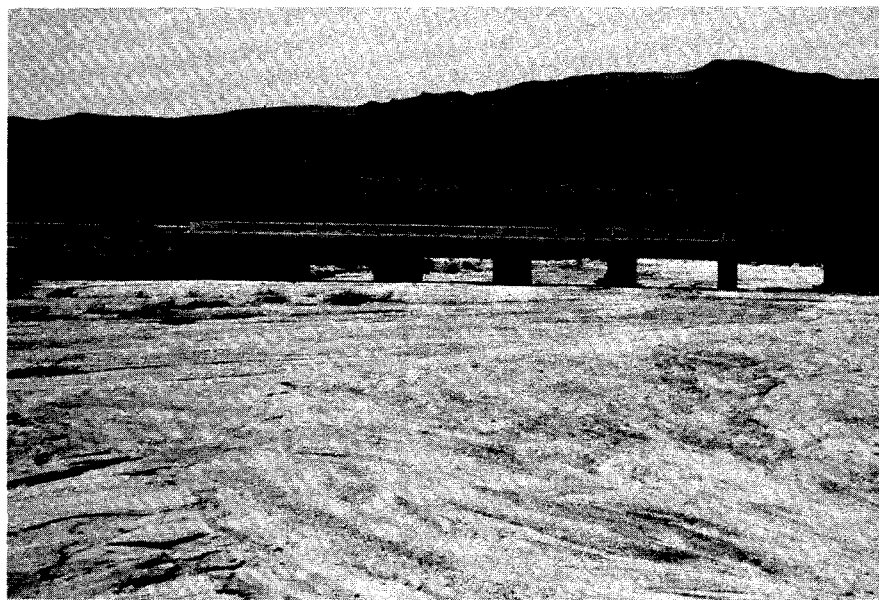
View downstream of bridge and damaged right-bank abutment in September 1964. (From Arizona Dept. of Highways.)
